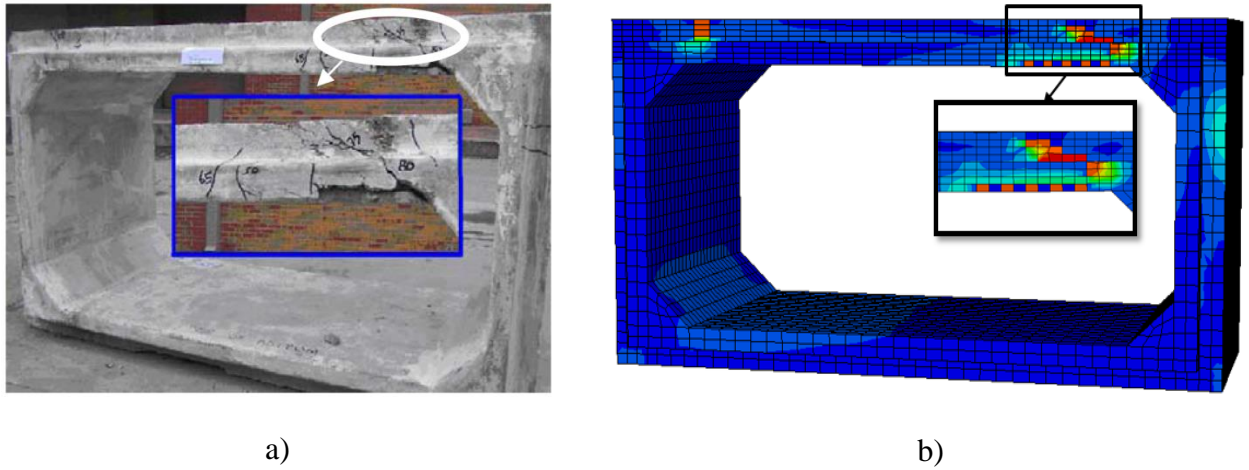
Location of crack on top slab of box culvert (SP-8-4-4-N) (a) experimental test (b) FEM
